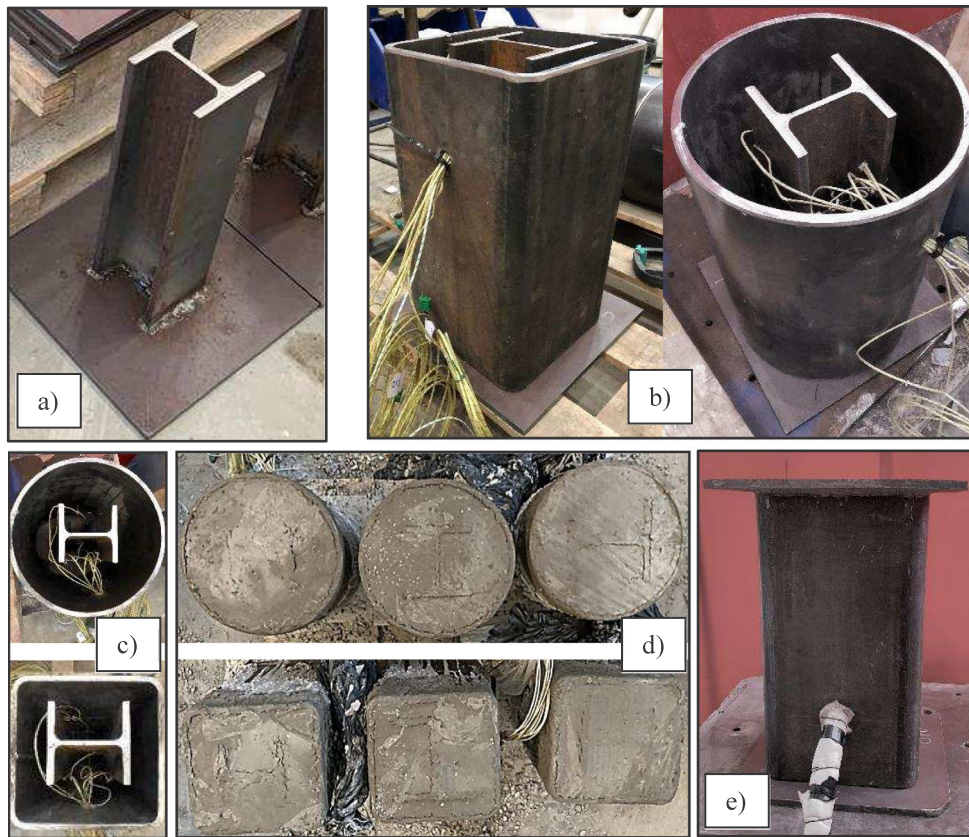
Columns preparation: (a) Steel plate welded at bottom end of the embedded profile; (b) Positioning of hollow steel tube; (c) Positioning of thermocouples; (d) Columns after casting; (e) Column finished.
